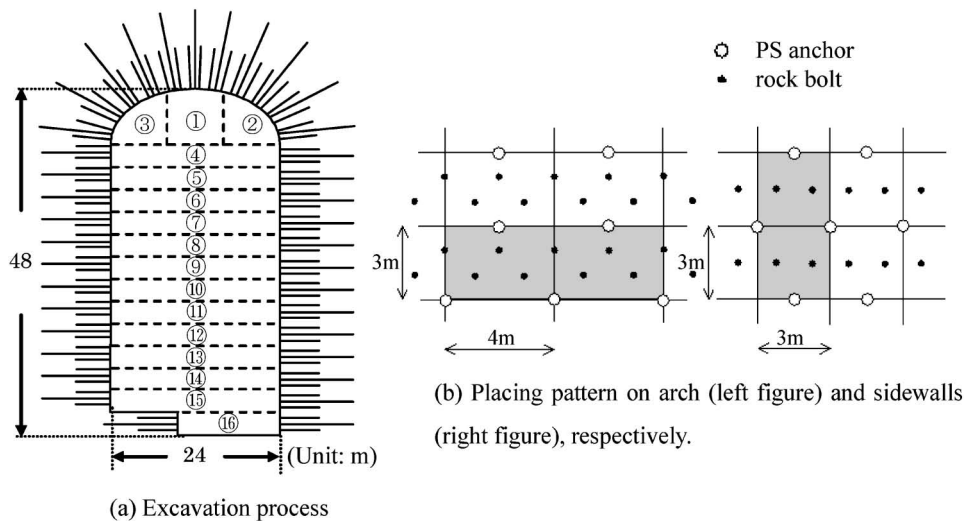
Illustration of the Bench-cut excavation process and placing pattern of PS anchors and rock bolts on arch and sidewalls
